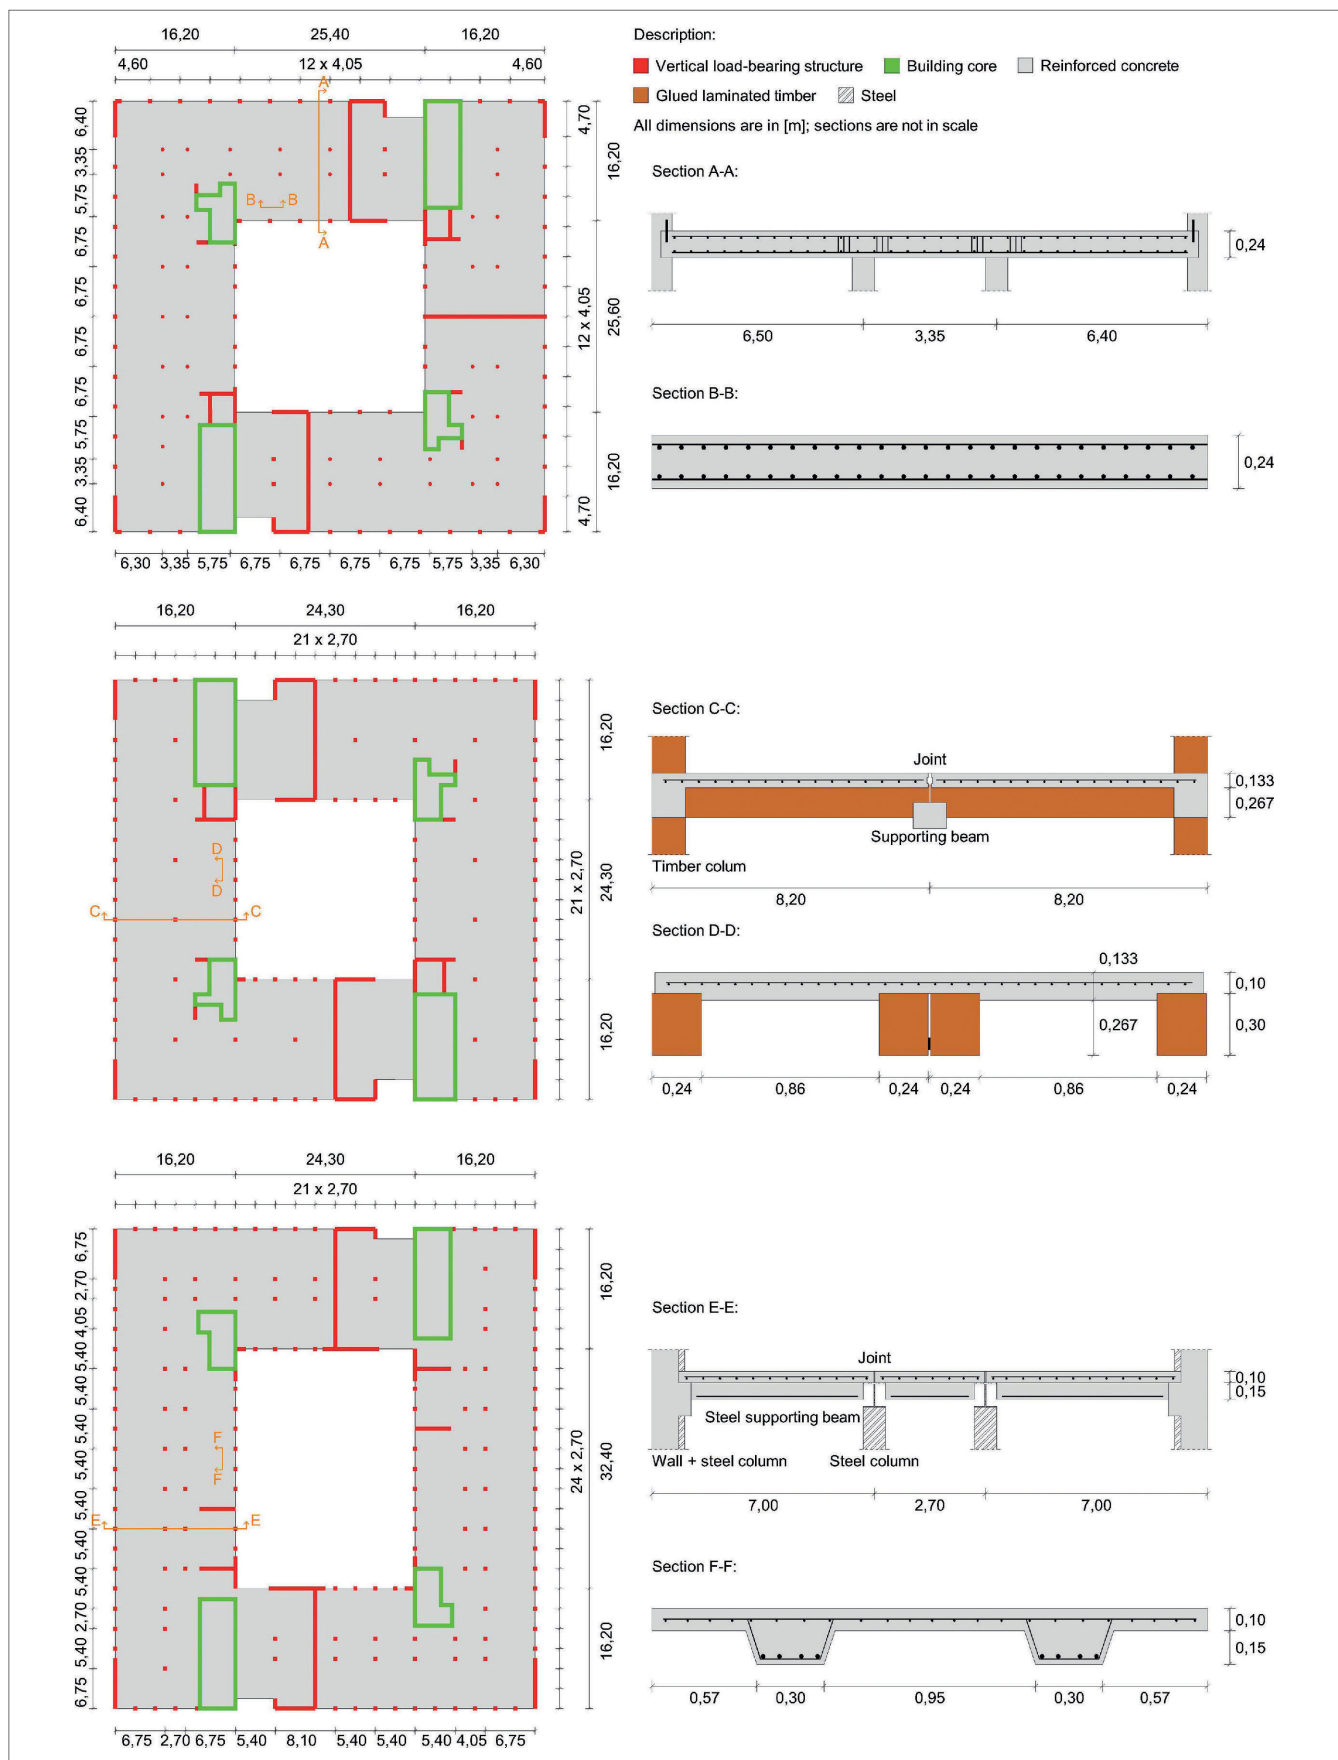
Schematic floor plans and sections of buildings G1 (top), G2 (middle) and G3 (bottom) Source: RPTU
